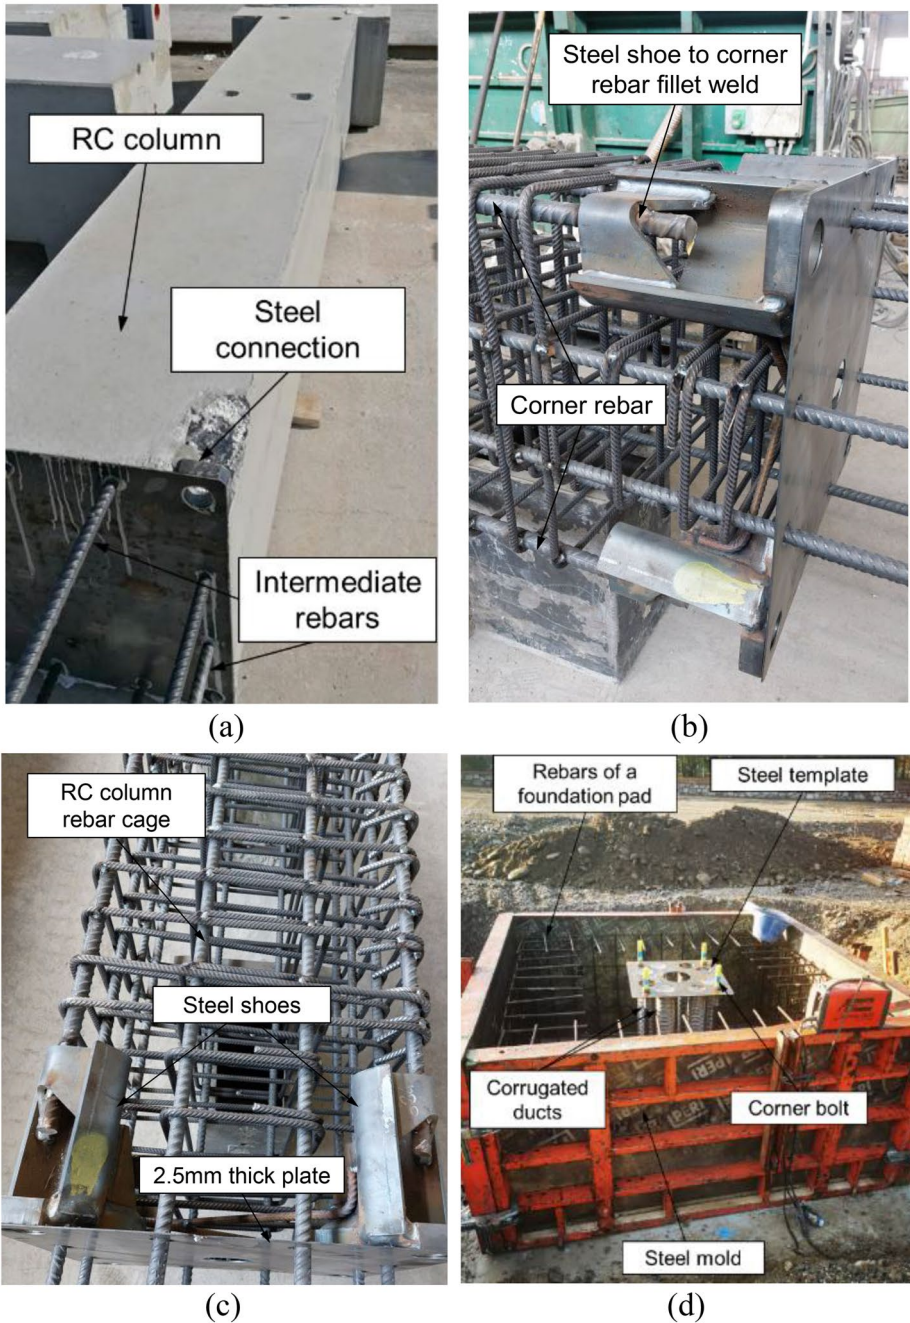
(a) View of a precast column with intermediate rebars. View of the column's rebar cage including the steel connection: (b) top view; (c) side view. (d) Corrugated ducts and hold-down corner bolts positioned in the rebar cage of a RC foundation
